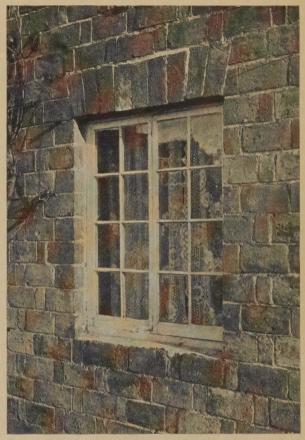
Detail of a charming cottage near Bridgewater, England; date of construction about 1803. All-rolok wall in Flemish bond.
